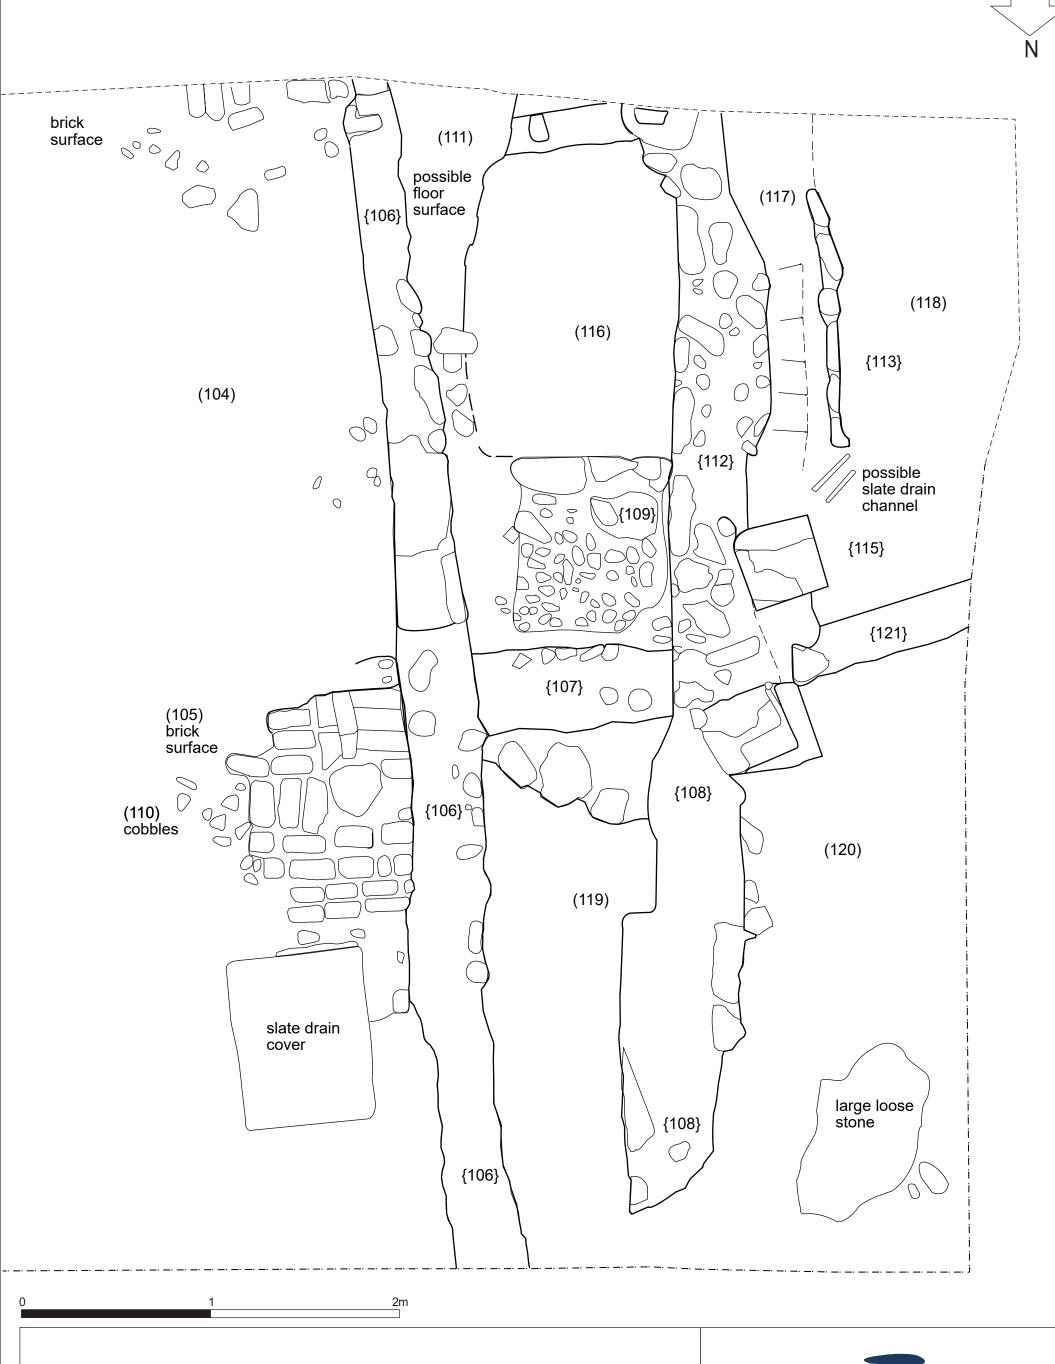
Plan of extension area (west side) showing truncated foundations and partitions associated with former outbuildings. Scale: as shown.
